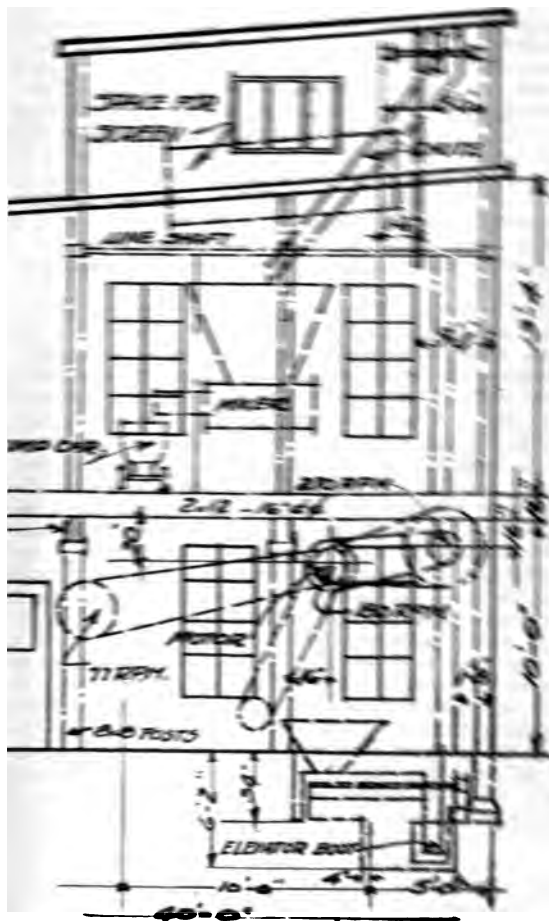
ELEVATION, SHOWING ELEVATING MACHINERY, PLANT No. 6
